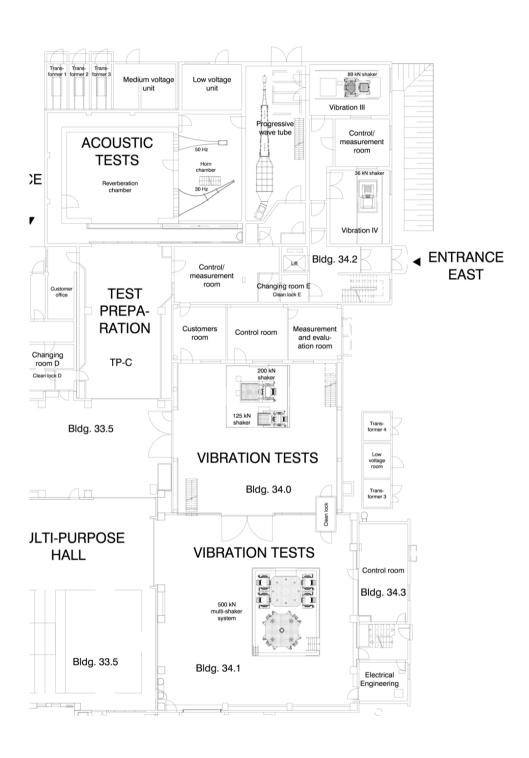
Layout of Building 34.0/34.1 Vibration Facilities
